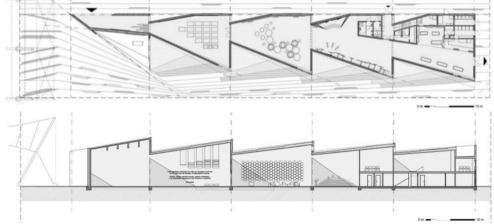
Floor plan and section of the Slovenian Pavilion in Milano World Expo, 2015[23]
